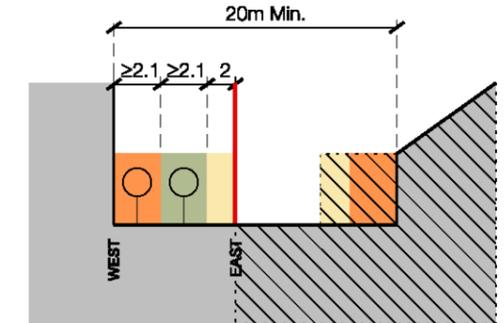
Stitching coding section: Plot J across to Cambridge Grove Road.
